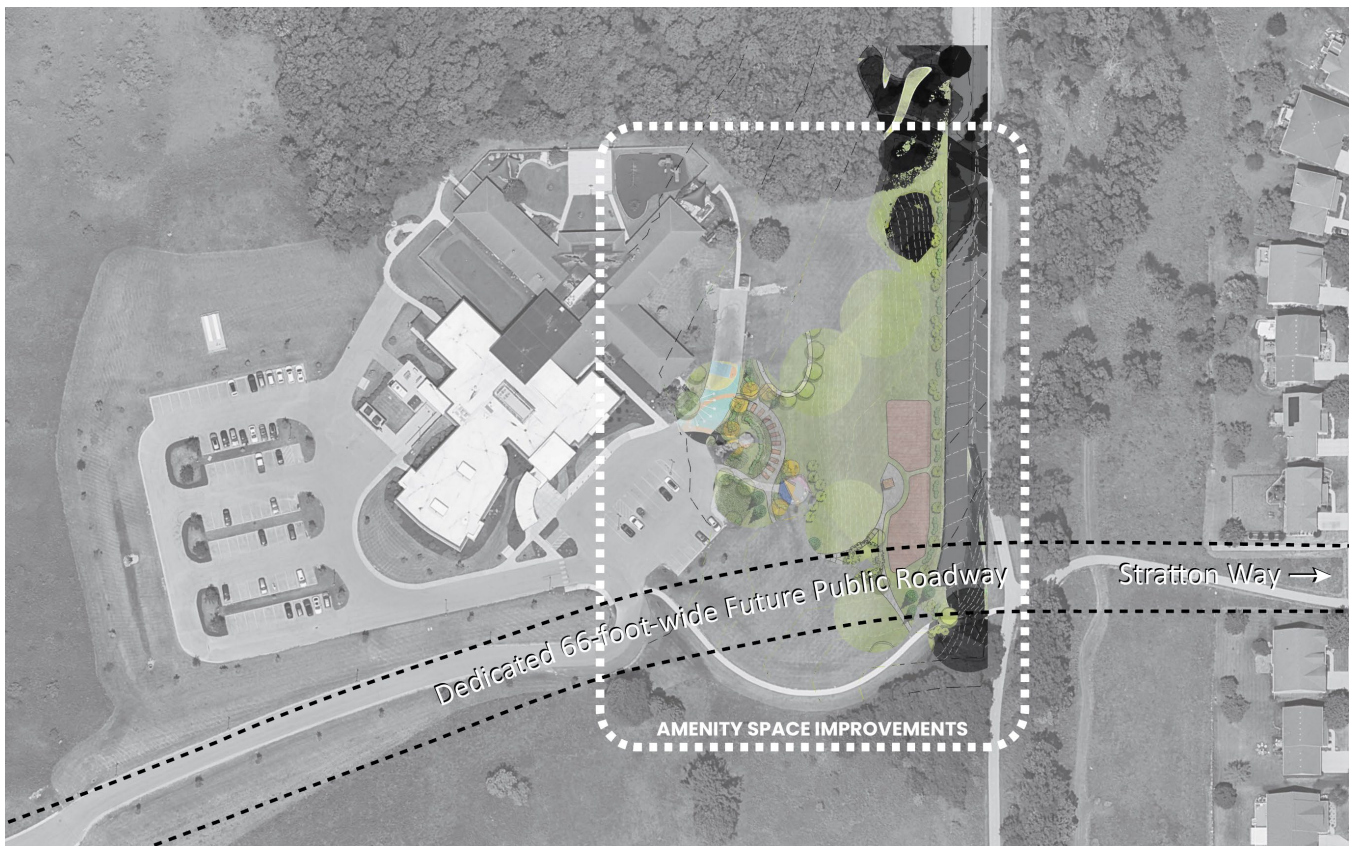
Exhibit Showing the Dedicated Future Public Roadway (Stratton Way) Across the Subject Site.
